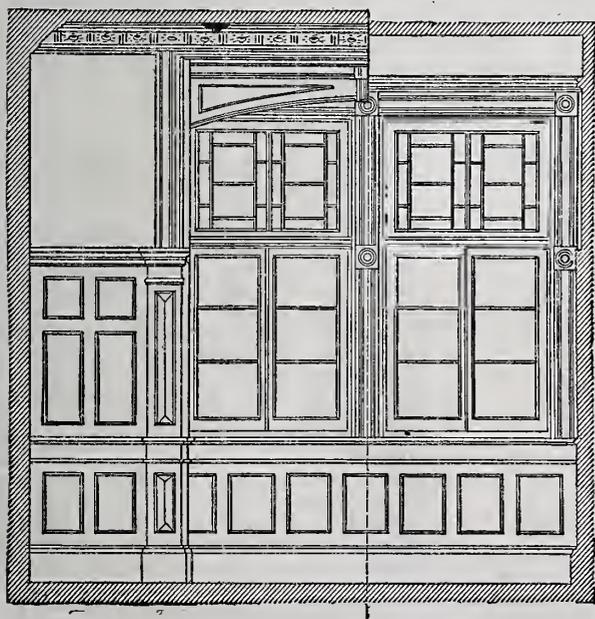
Half Elevation of End of Room.—Scale, $\frac{1}{4}$ Inch to the Foot.
